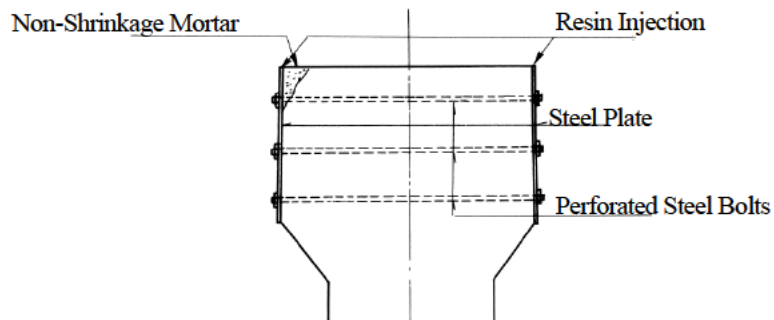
Steel Plate Attachment (Sandwich Connection)
